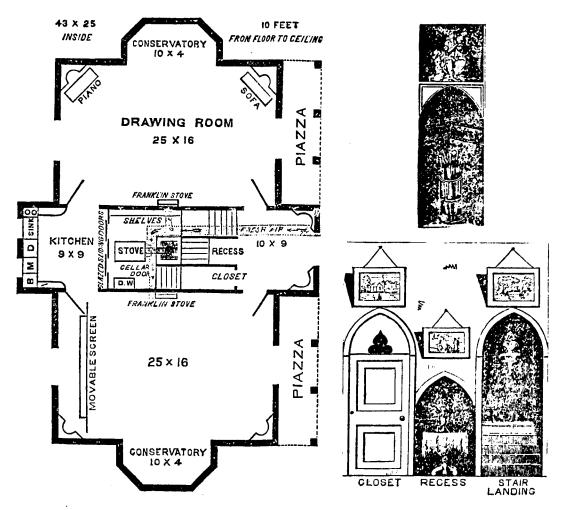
Floor plan, hall plan, and recesses for Beecher's "Christian house."
